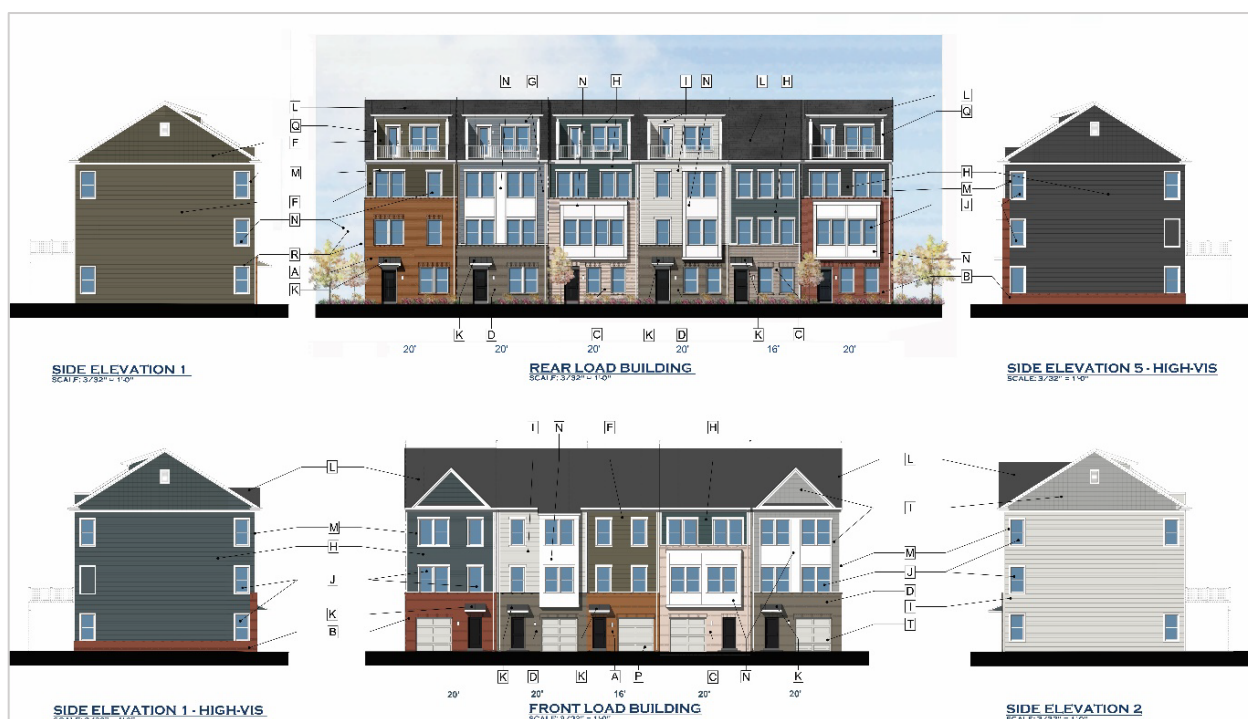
Rendered elevations of rear- and front-loaded townhouse building strings
